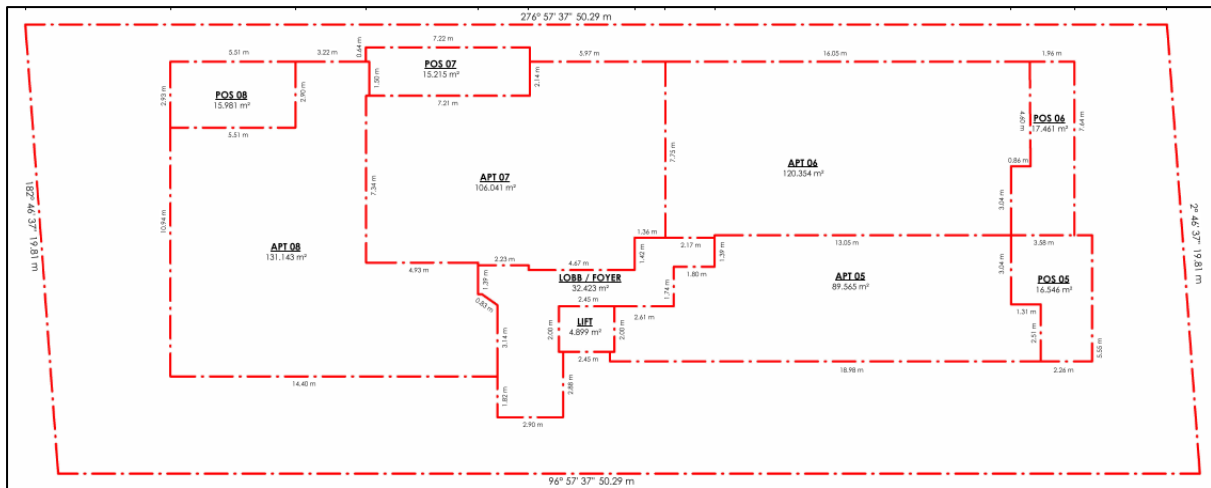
(Above) Proposed mid (first) floor plan of subdivision. Source: Application documents.
